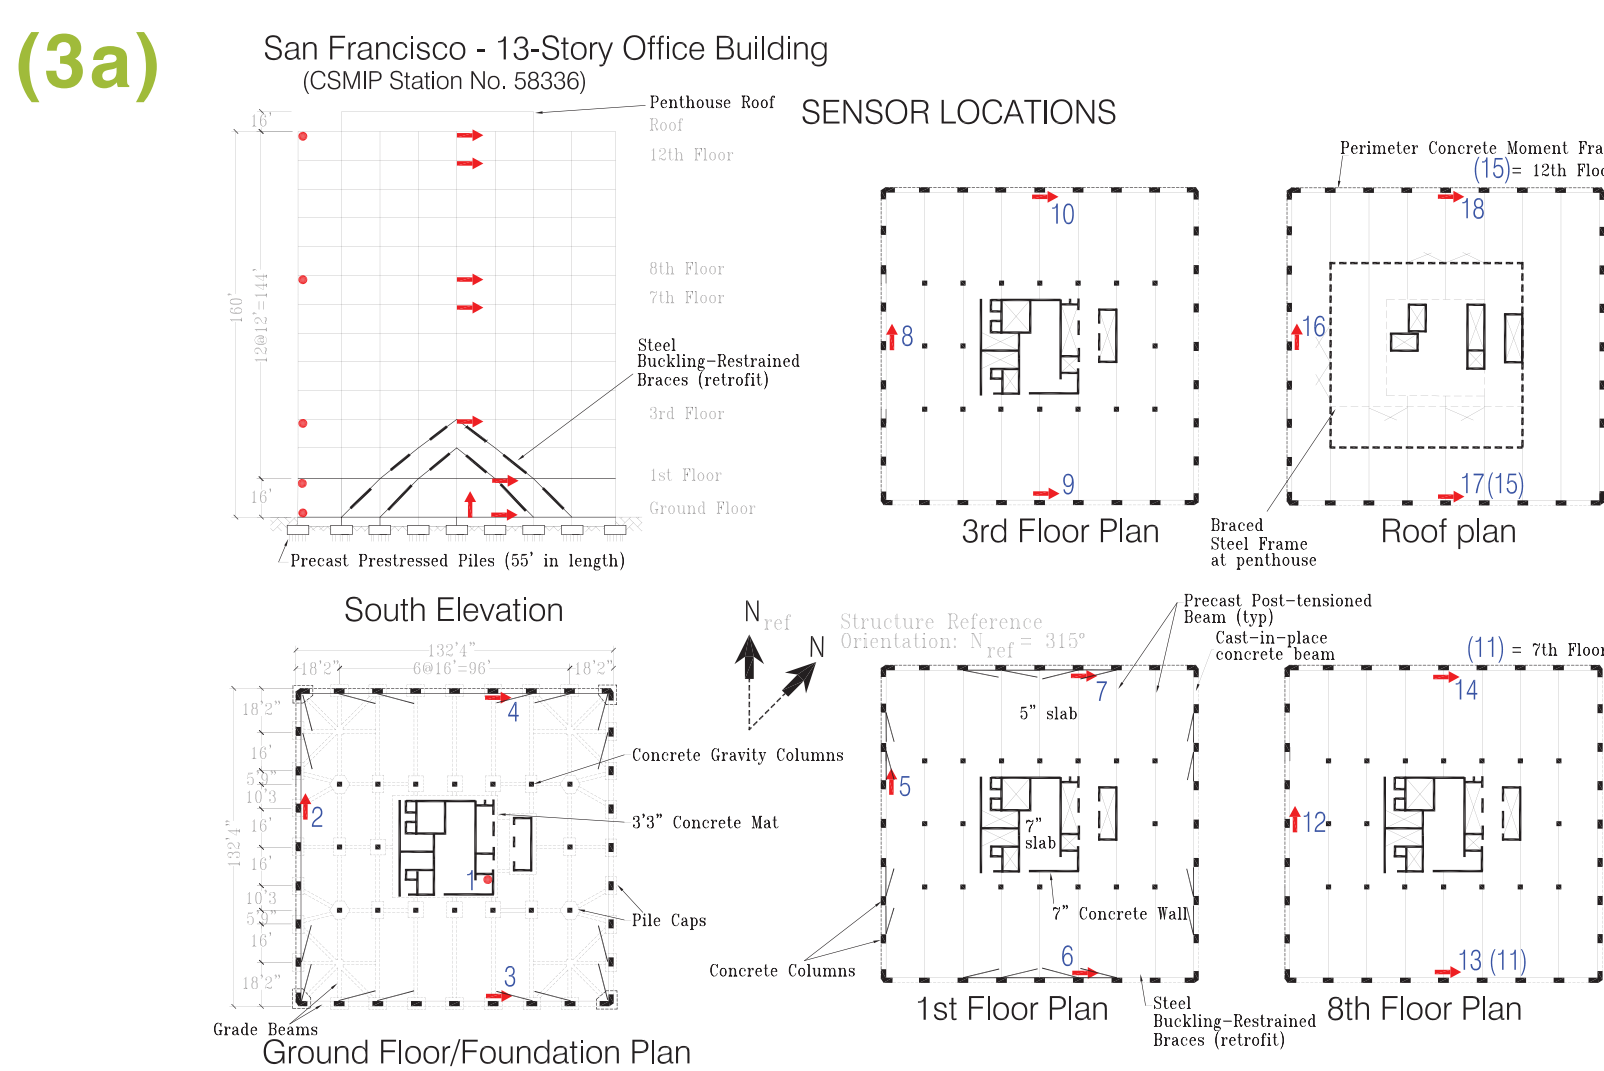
Floor plans for a 13 story office building in San Francisco, CA with arrows to indicate the locations and orientations of CESMD accelerometers³.
